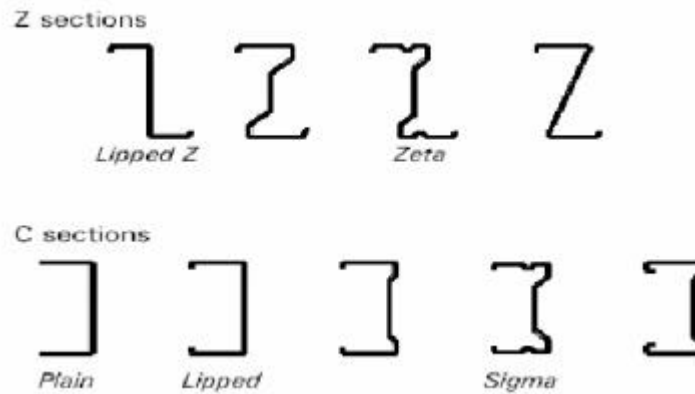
Common shapes for cold formed steel (C and Z section)
